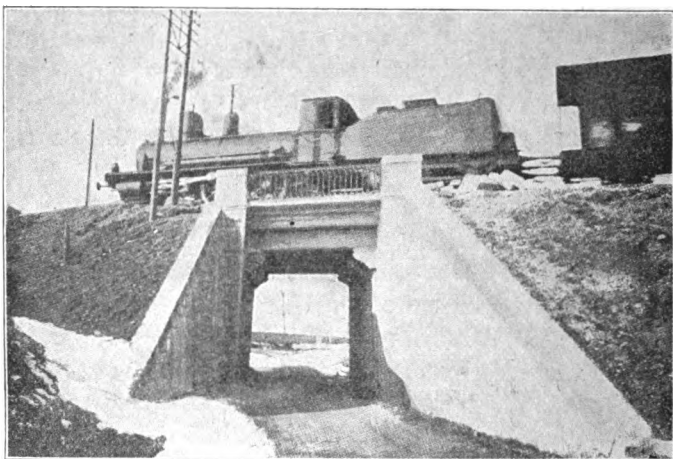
Reinforced Concrete Girder Railroad Bridge.
